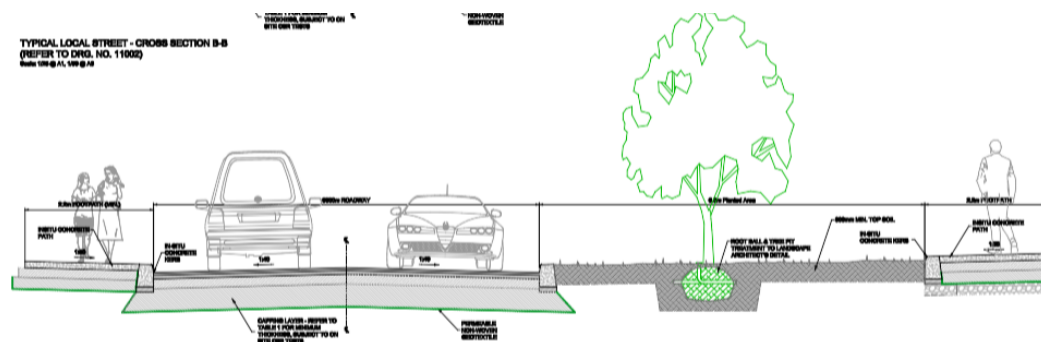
Typical Local Street Cross Section (Source: RPS Dwg No. KSG5-RPS-KSG5A-XX-DR-C-11021)
